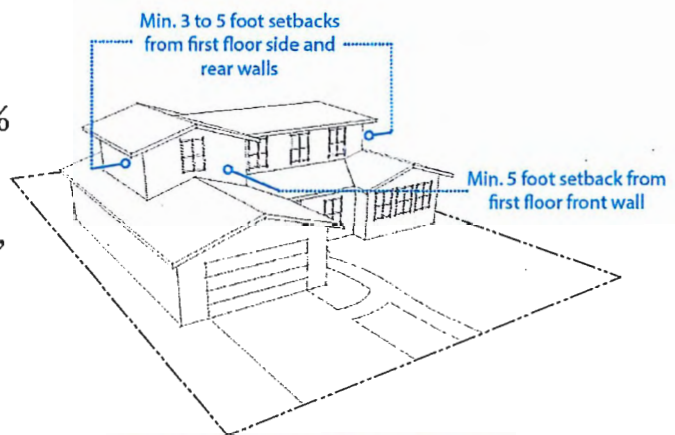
Second-story addition setbacks are measured from first floor walls planes.
